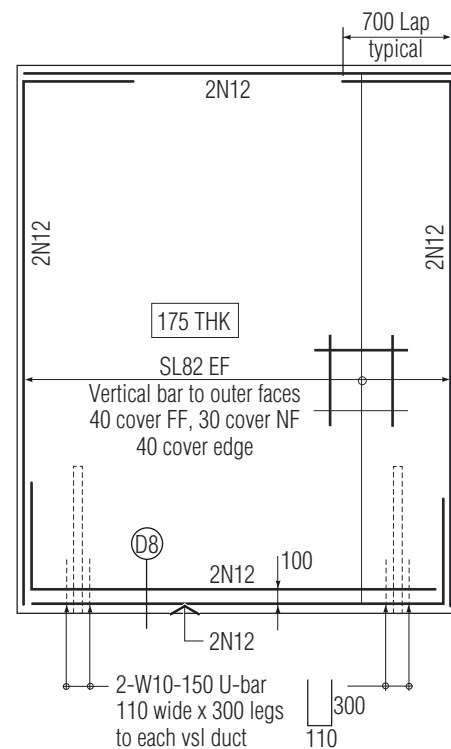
This figure shows an elevation of a precast wall panel with two layers of mesh reinforcement, trimmer bars, grout tubes, etc.
